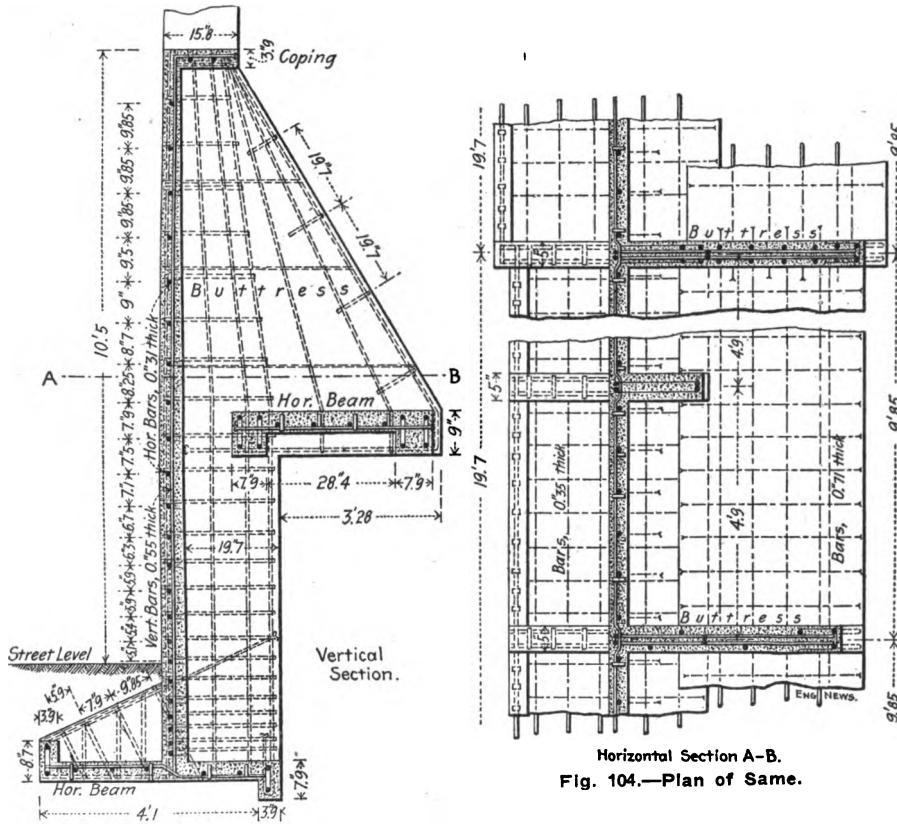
Section of Retaining Wall Used at Paris Exposition, Hennebique System.
